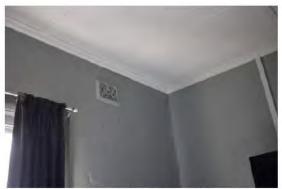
| Decorative celing vent and ceiling profile in Lewis St common room.
